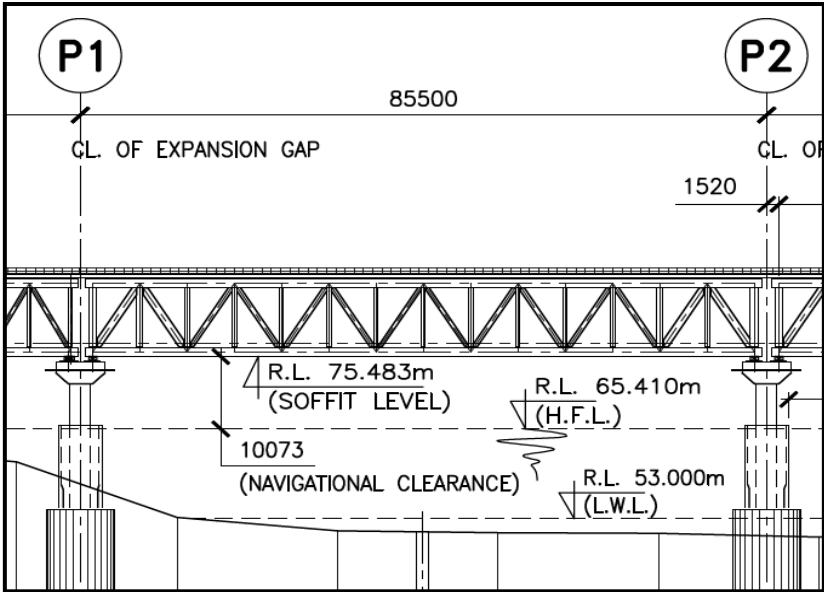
Side Elevation of Main Span in Longitudinal Direction
